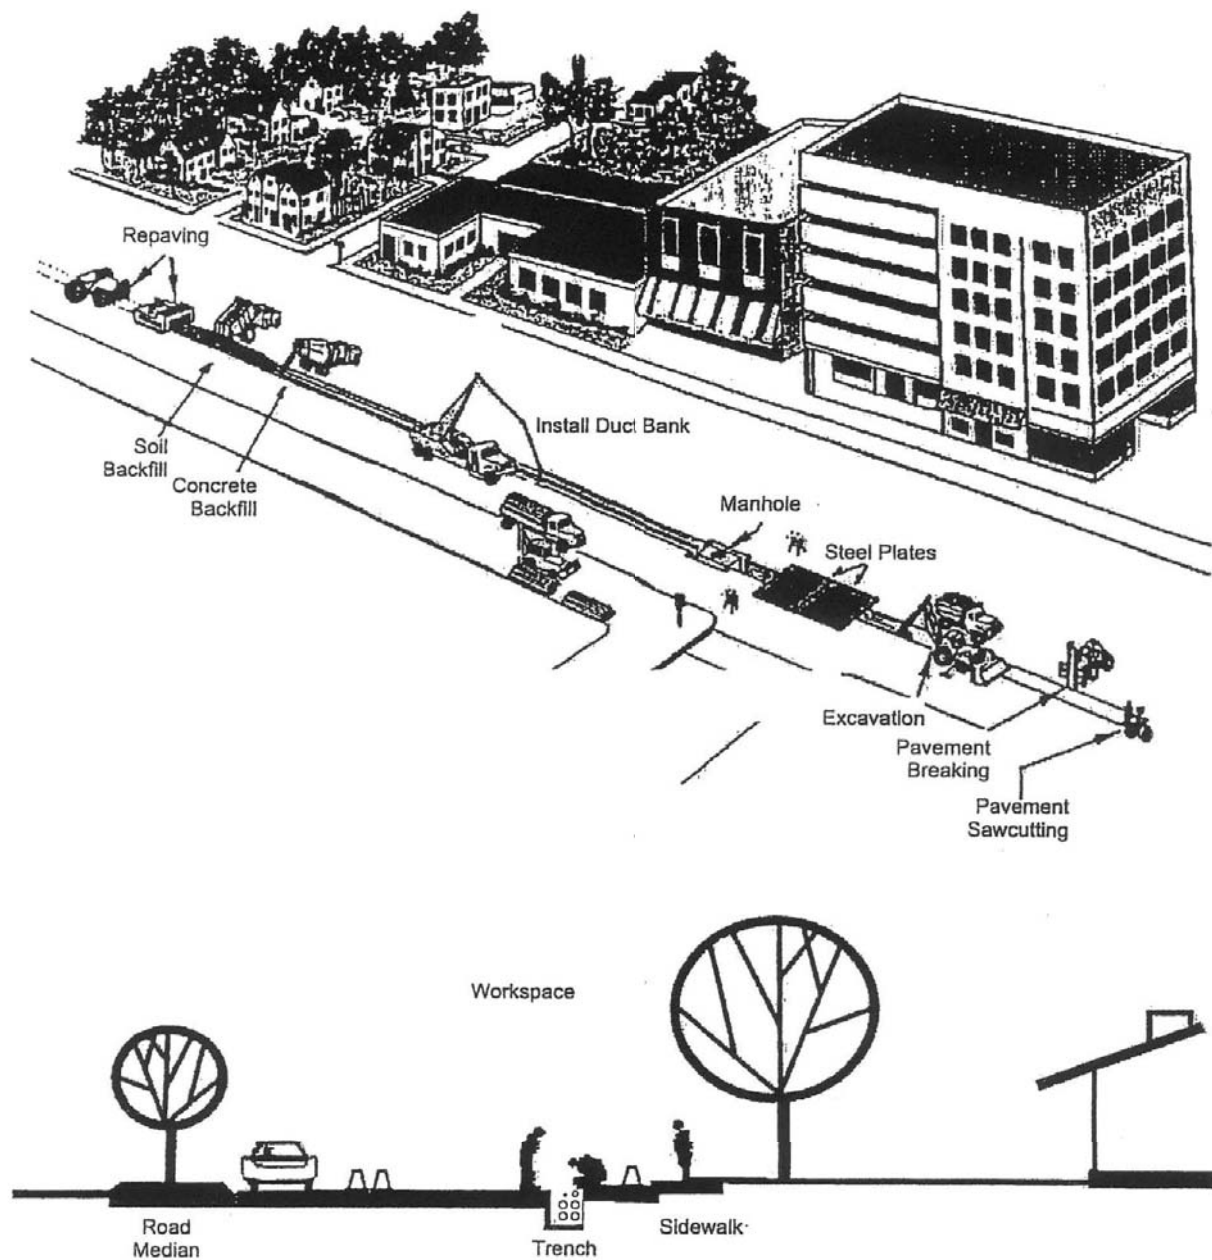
Underground Conductor Installation Procedure Typical Drawing
